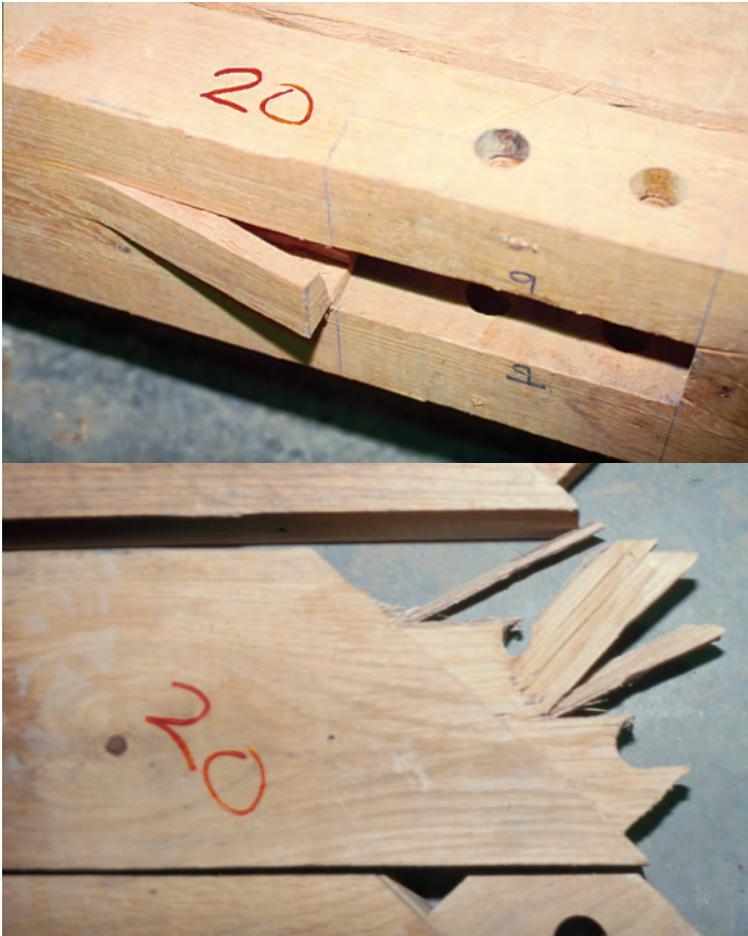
B. COMPLETE DESTRUCTION OF BRACE TENON AND DAMAGE TO MORTISE AT JOINT 20 (OAK FRAME).
